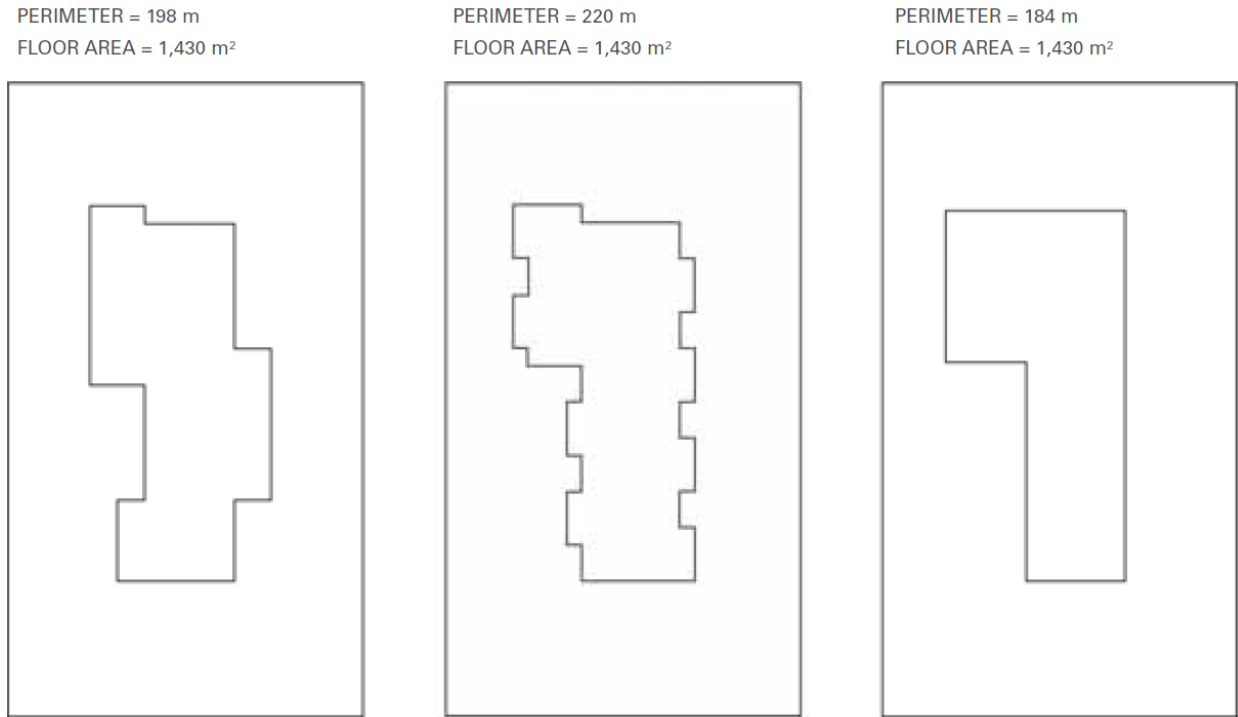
Same floor area with varying building perimeters (Building and Construction Authority, 2010)
